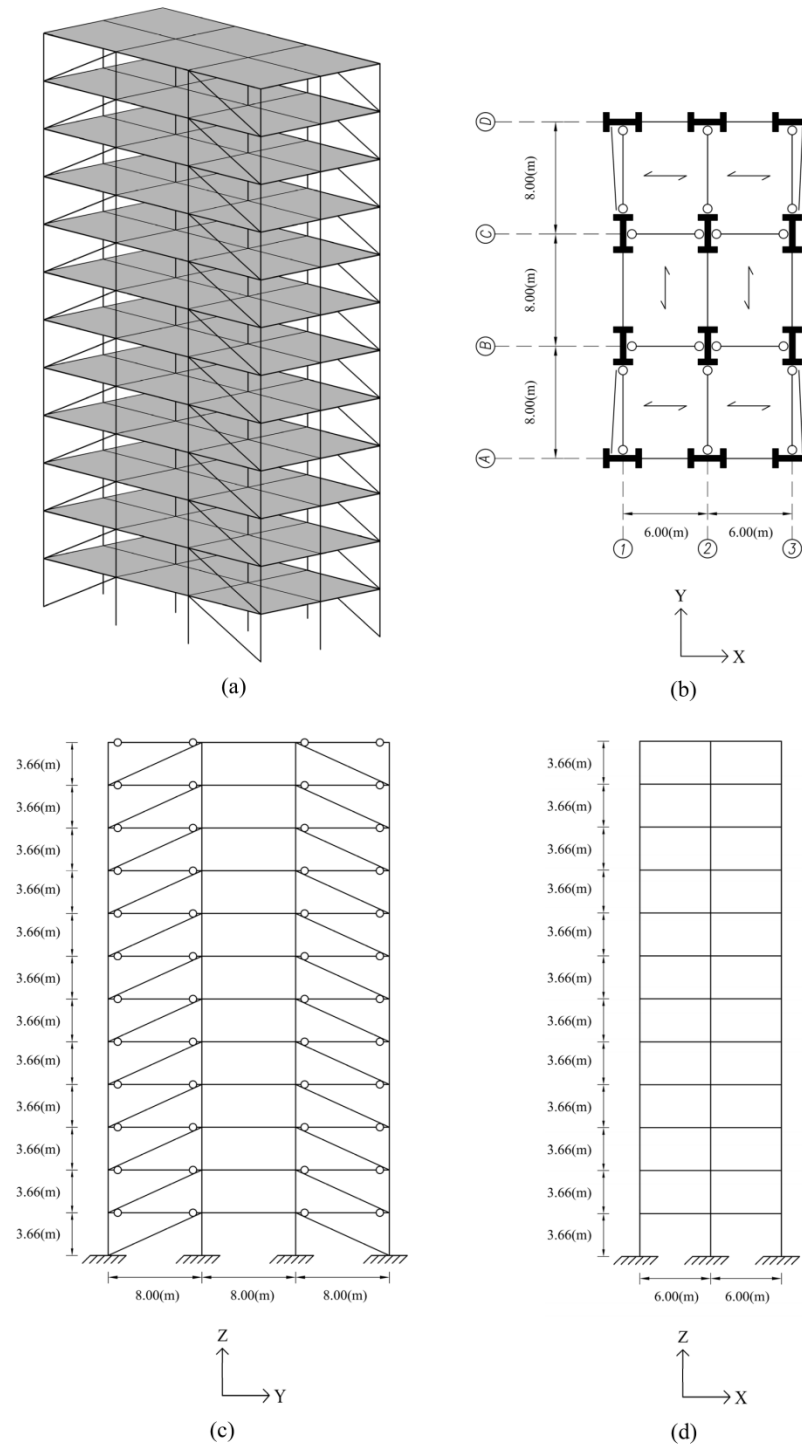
A twelve-story steel frame structure: (a) 3D view; (b) plan view; (c) exterior elevation view in Z-Y plane; (d) exterior elevation view in Z-X plane
